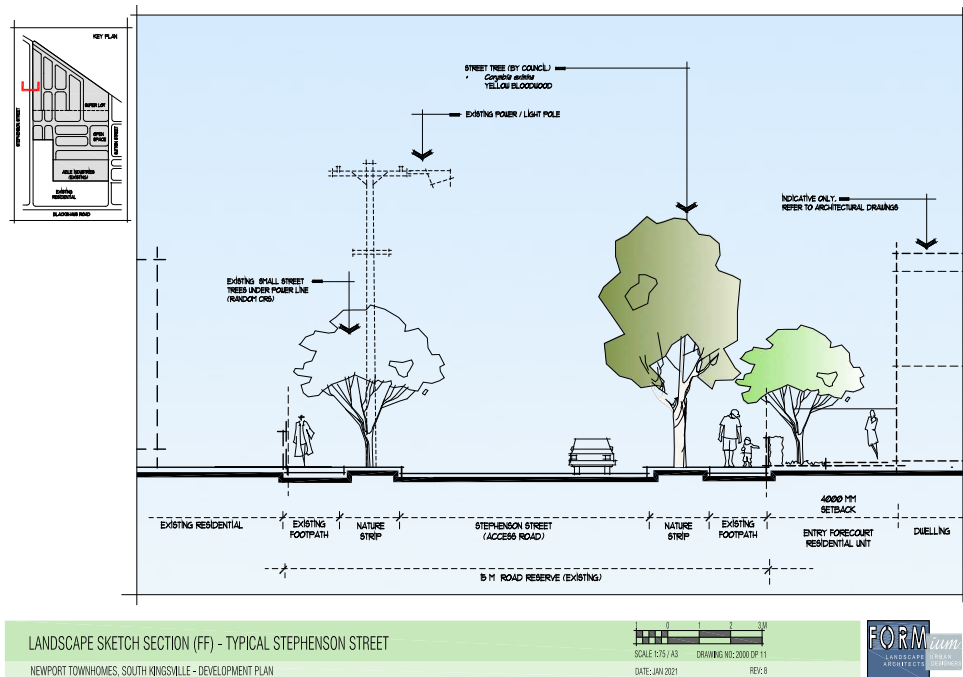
Indicative Typical Stephenson Street Section (Source: Formium)
